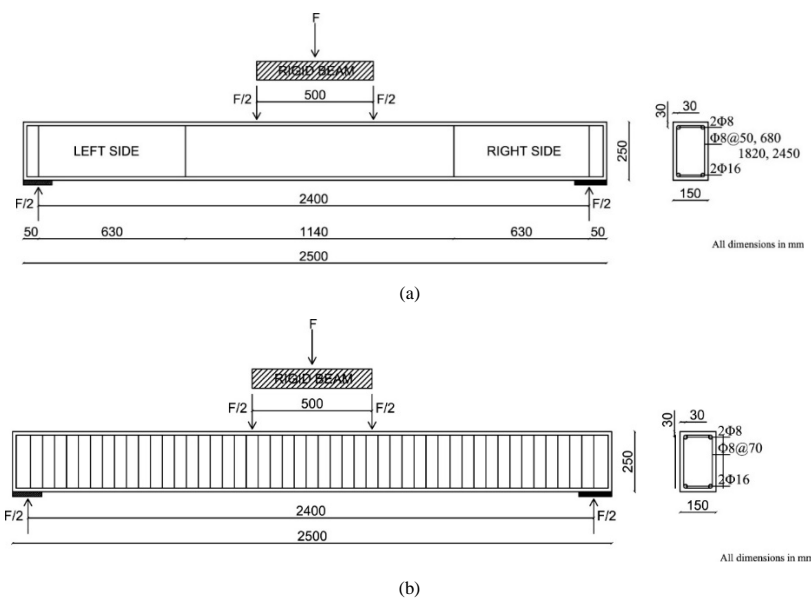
Reinforcement scheme and dimension details (a) shear critical specimen, EB_R (b) over-reinforced specimen, EB_C
